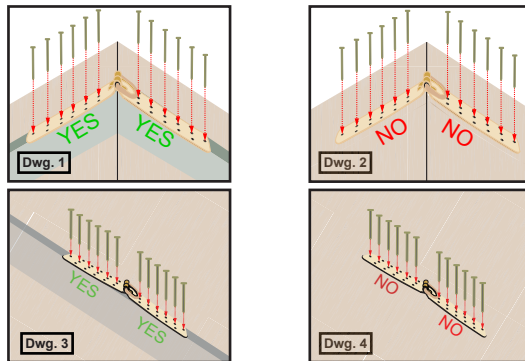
NAIL INSTALLATION DIAGRAM
